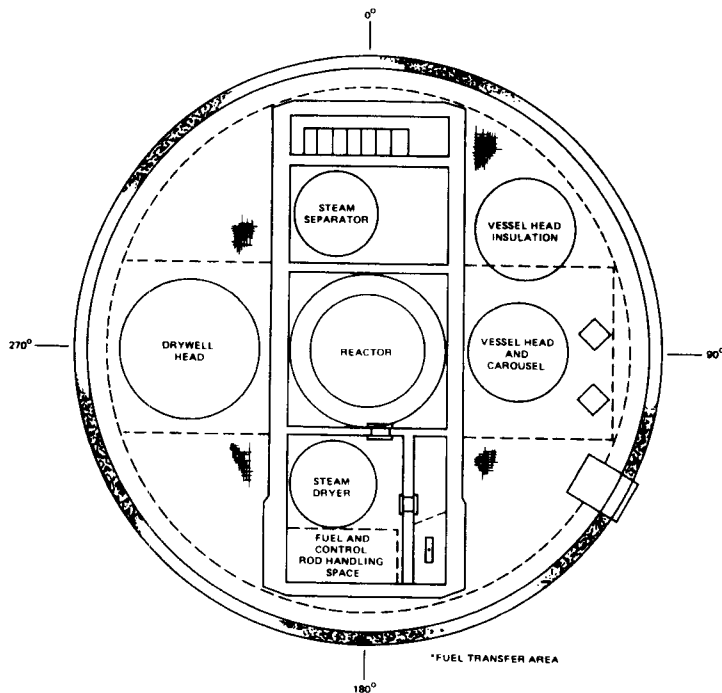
Reactor Building Refueling Service Floor Laydown Areas
